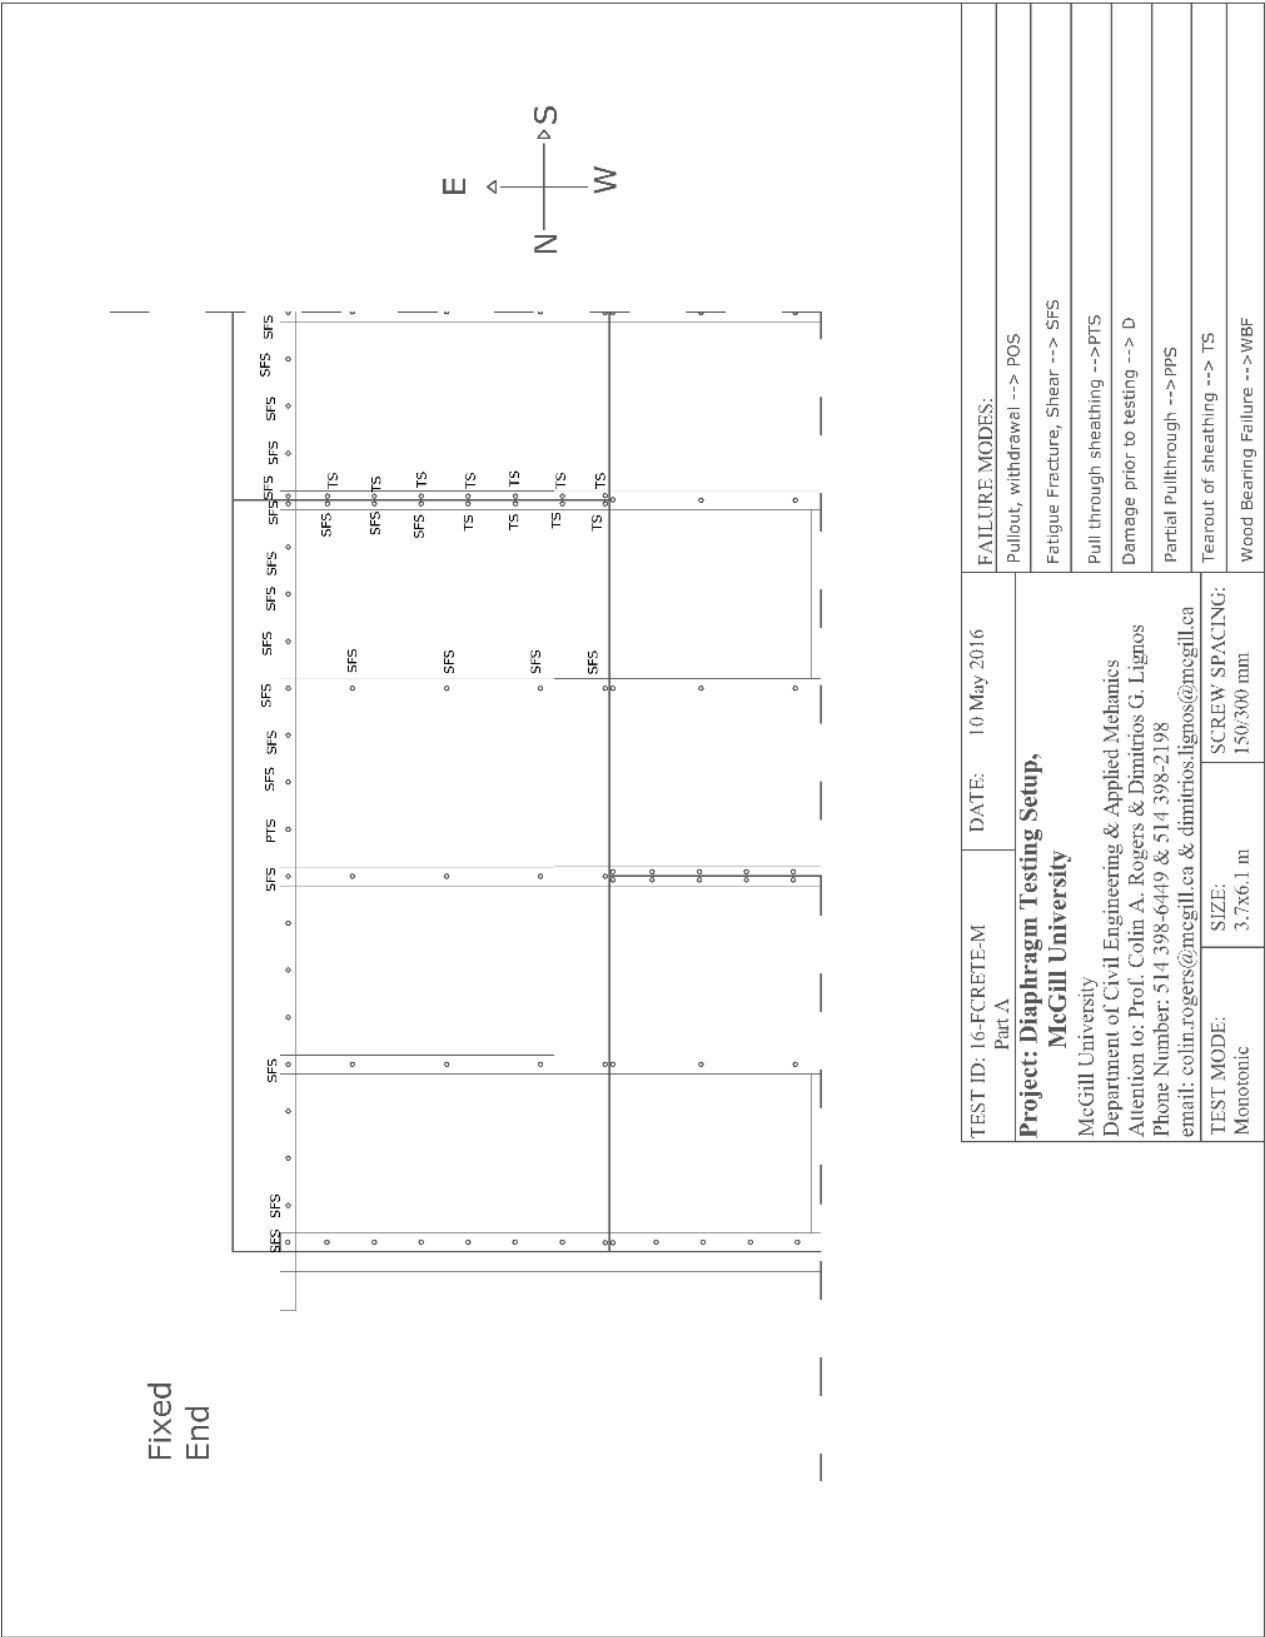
Sheathing Fastener Failure Modes Part A Specimen 16-FCRETE-M
